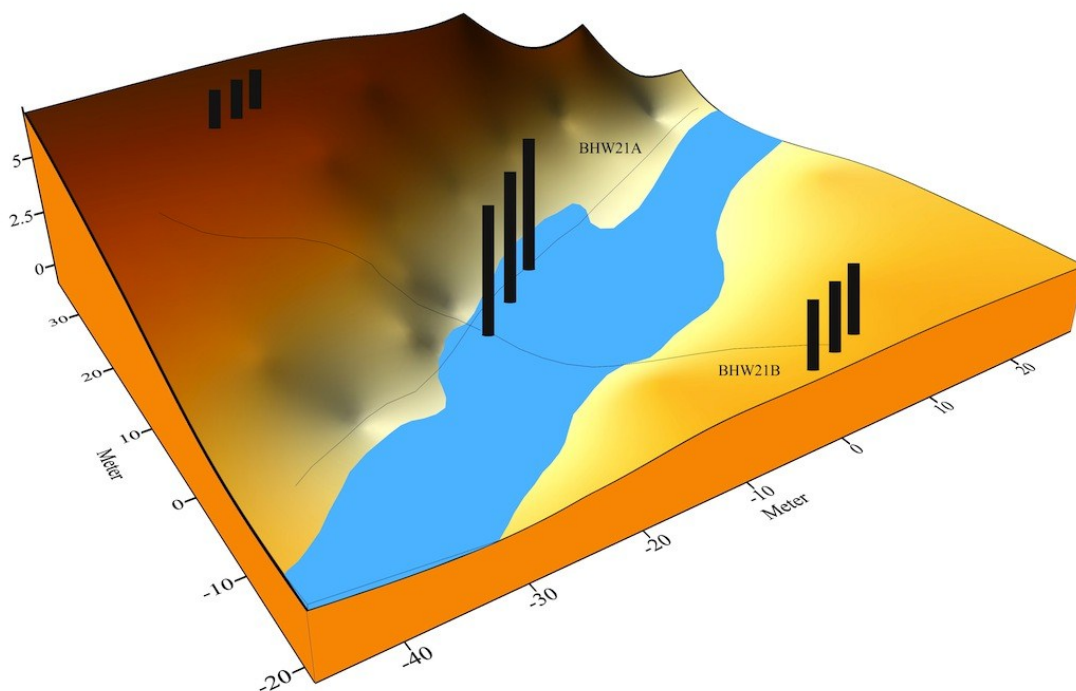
A 3D schematic view plan of the bridge on Highway 21 site with resistivity survey profiles and locations of foundations.
